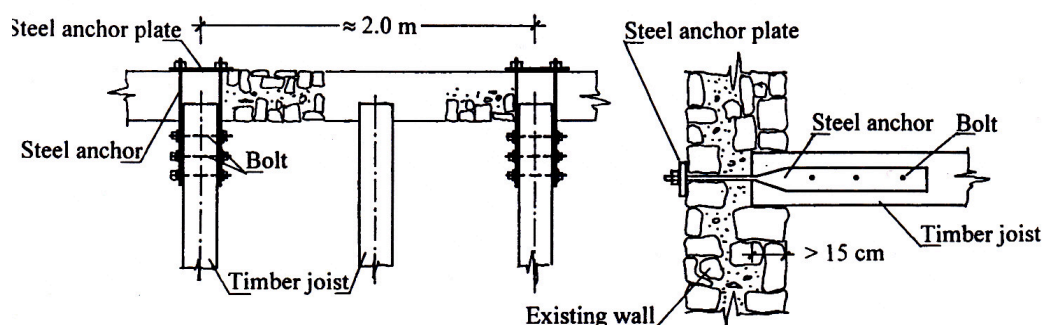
Detail of anchoring of a wooden floor into a stone-masonry wall [21]
